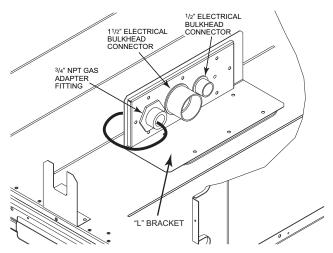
Thru-Base Connection Fittings (Size 16 Shown)
